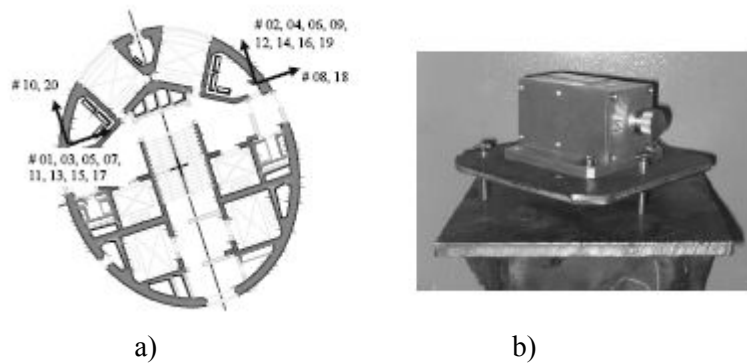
a) Plan position of accelerometers and channel labels, b) An installed accelerometer.
